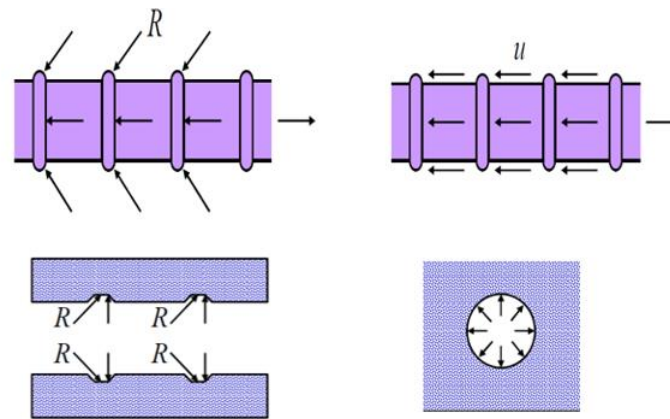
Reactive forces acting on concrete during rebar pull-out
